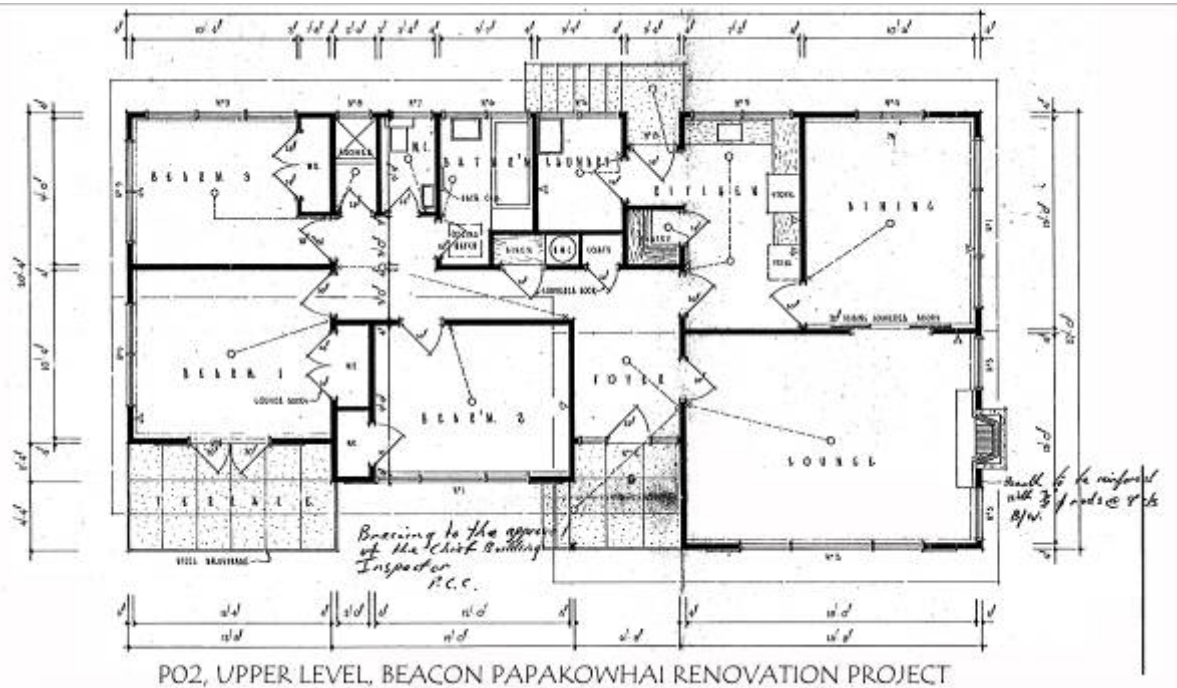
P02 Floor Plan (note that the lower level is not shown here).
